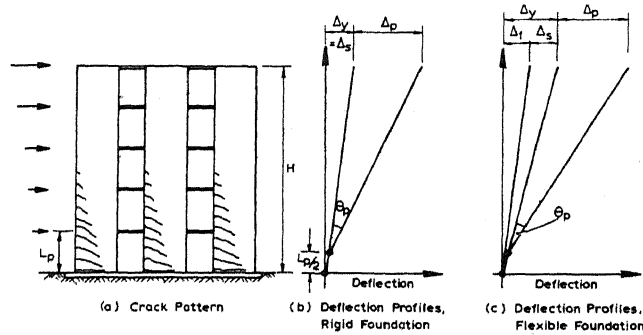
Cantilever Shear Walls Linked by Flexible Floor Slabs
